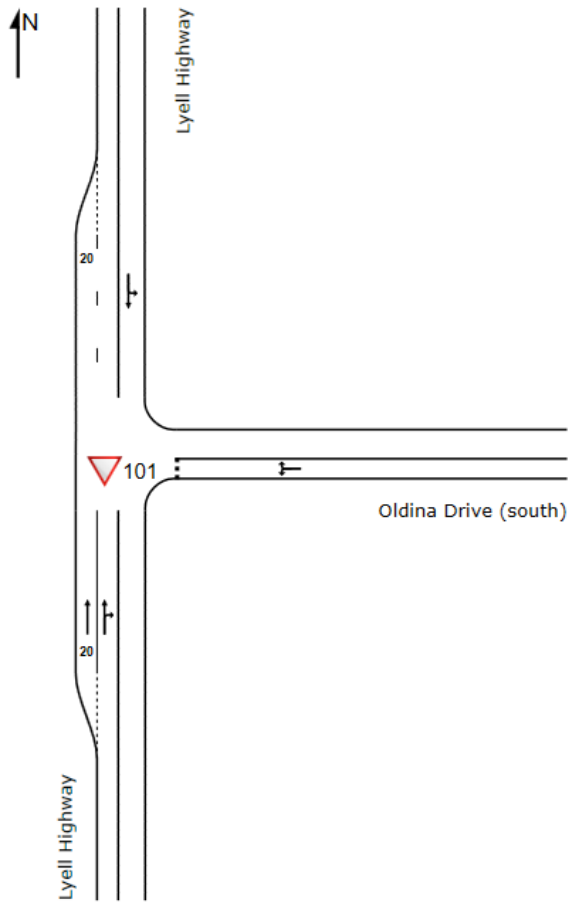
Geometric layout – Lyell Highway/ Oldina Drive (south) intersection
